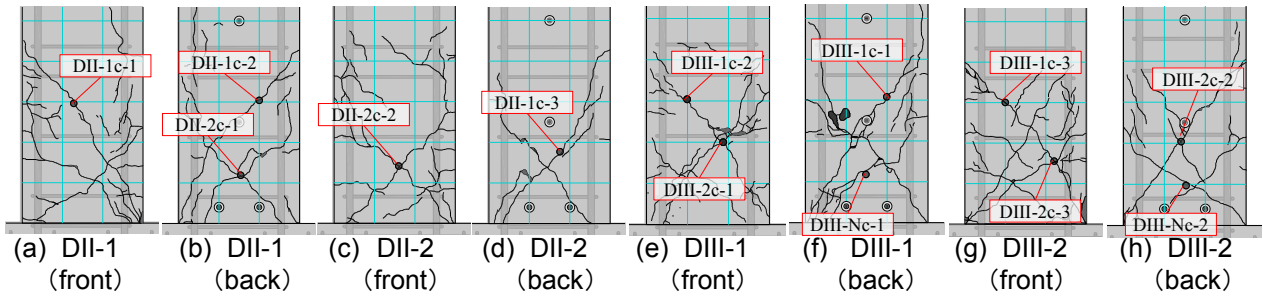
Crack in beam specimens after shear loading tests.
